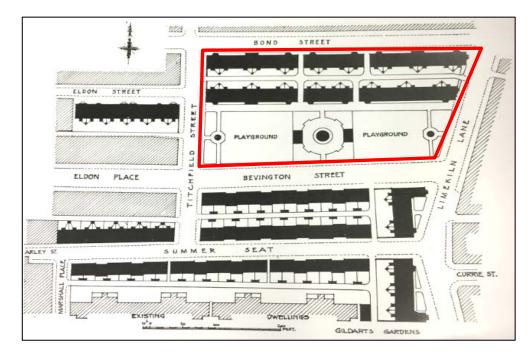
Plan of the Bevington Street area (following rebuilding) c.1912¹⁶
